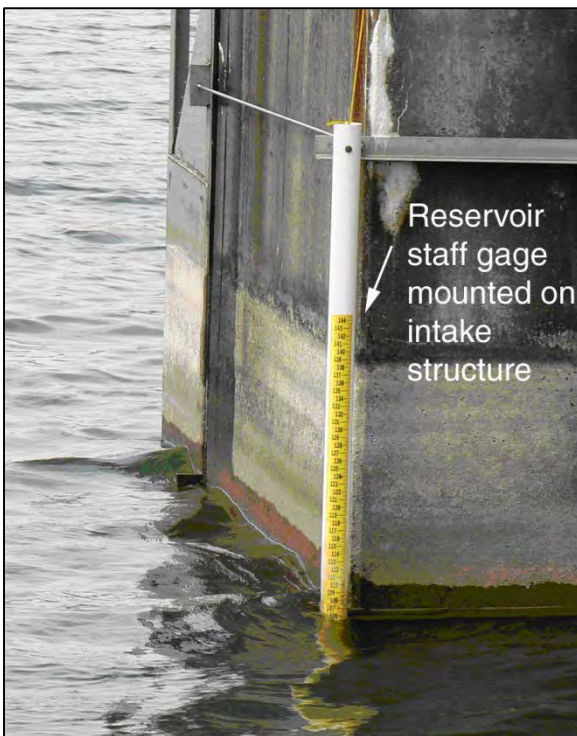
Staff gage indicates reservoir water level (elevation).
